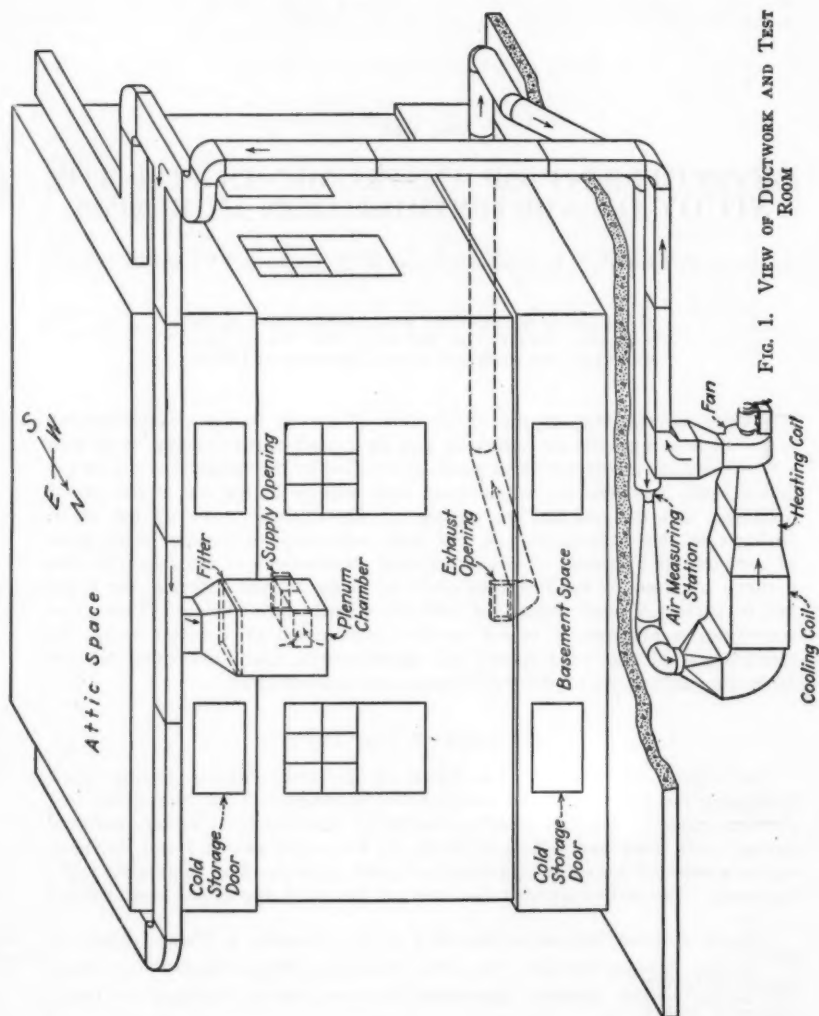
VIEW OF DUCTWORK AND TEST ROOM
